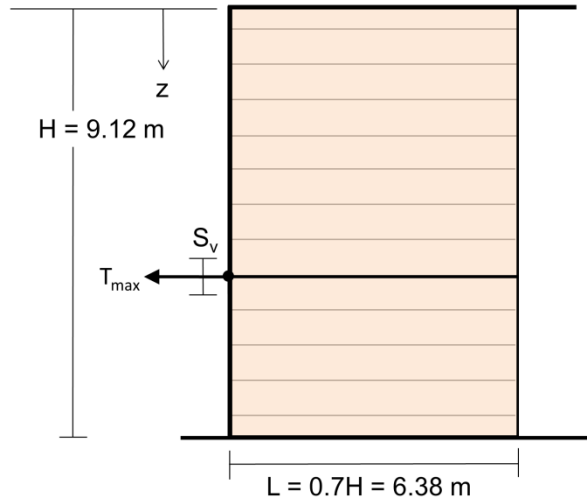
Problem geometry and reinforcement layout for example wall (after Allen and Bathurst 2018).
